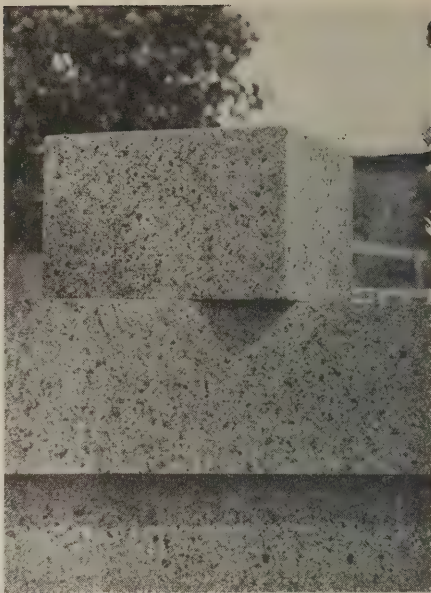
Flat granite surface concrete block, used for first floor walls of houses shown in Figures 1 and 2
